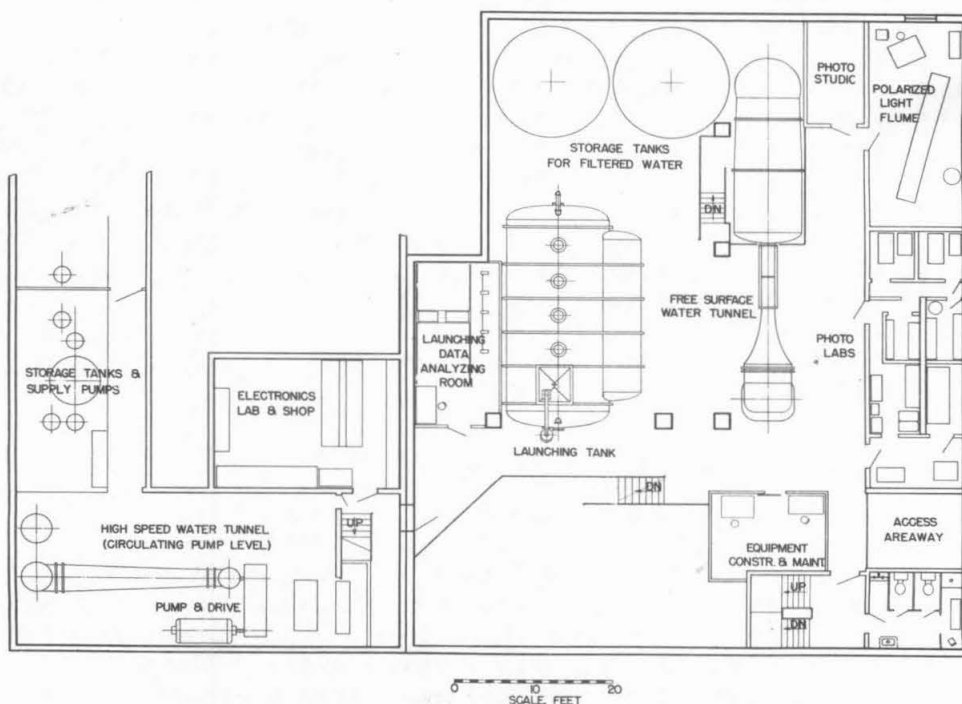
B - PLAN OF BASEMENT OF LABORATORY
